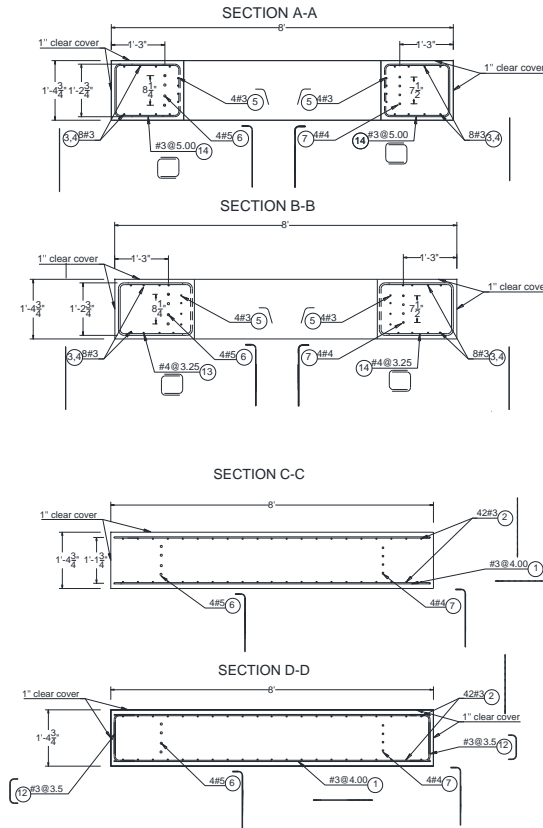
Sections A-A, B-B, C-C and D-D in design drawing for Specimen 7 (see Figure 5.1 for the location of the sections)
